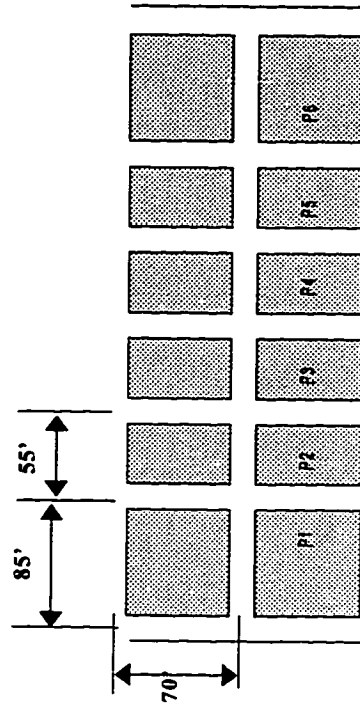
Floor heave and pillar punching in five-entry system
